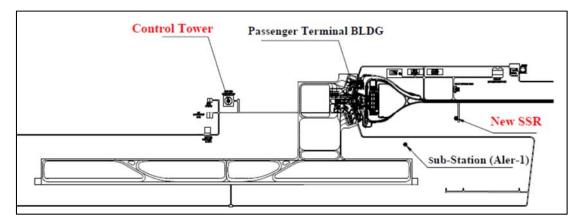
Nay Pyi Taw International Airport Facility Layout Plan
